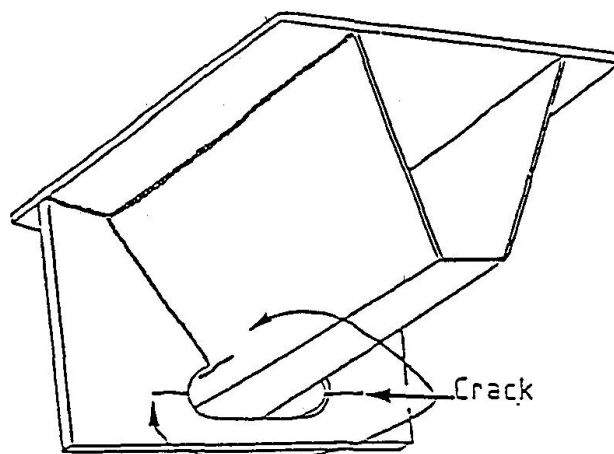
Diaphragm-to-rib connection showing typical crack locations at the cutout
